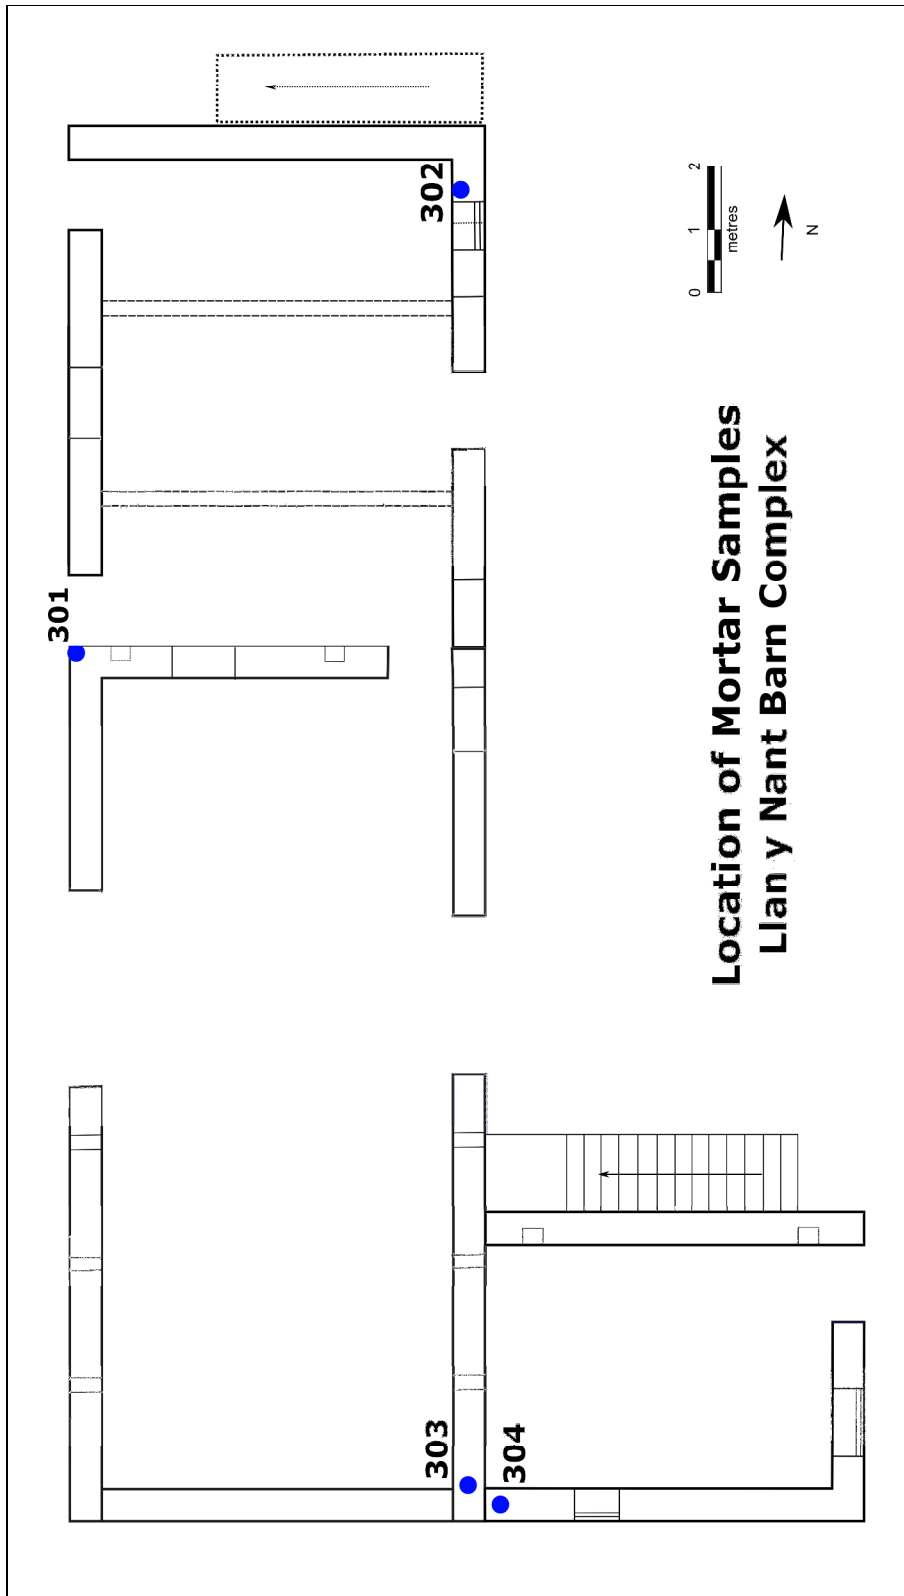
Plan of Llan y Nant Barn complex showing locations of mortar sample points, details in Appendix B.
